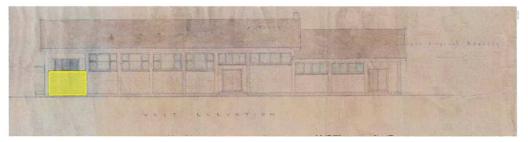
Original west elevation (typical URM panel highlighted in yellow)
